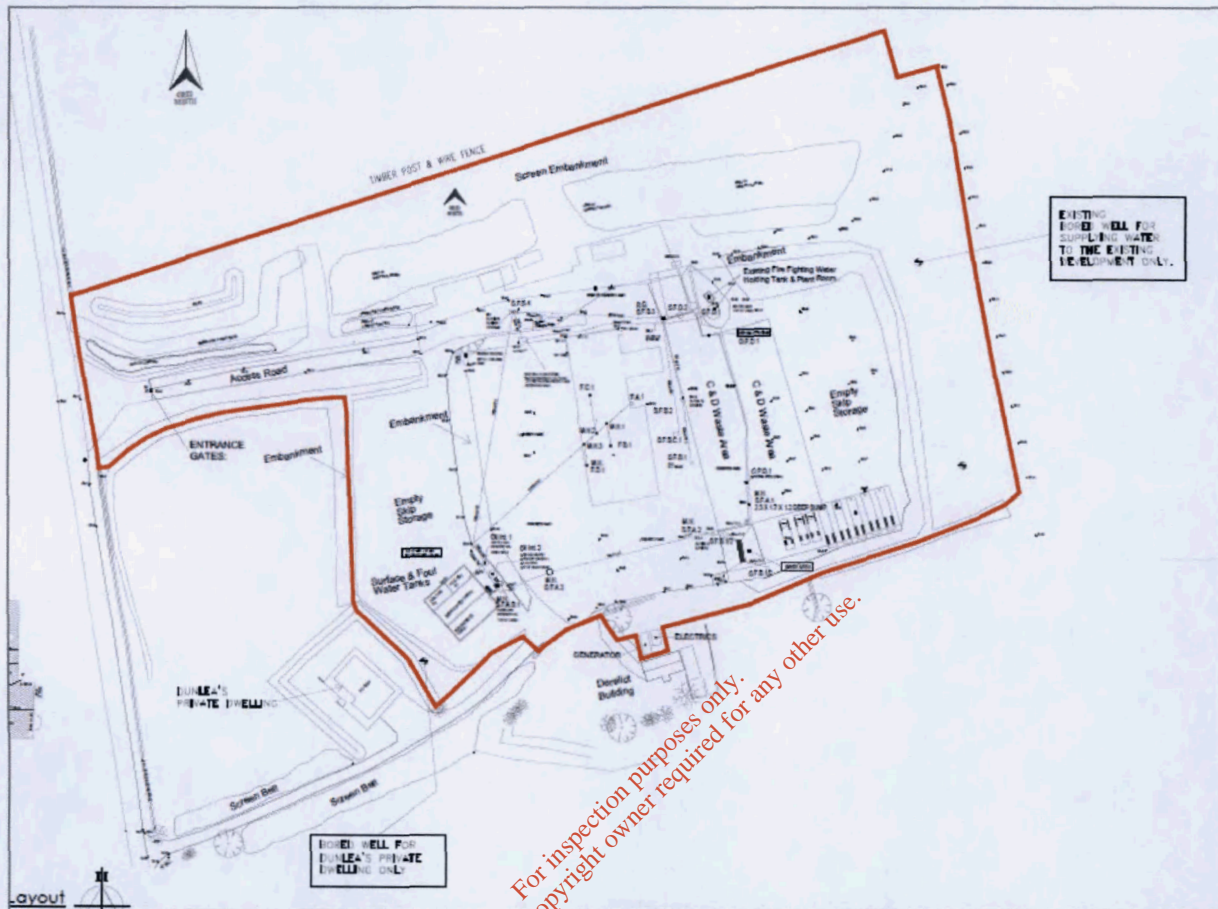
Existing site layout (refer to DOSA Drawing no. 5851-0502-B).
